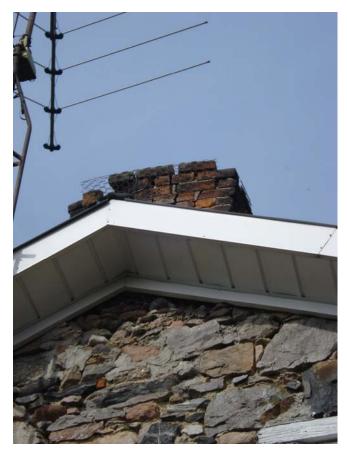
Spalling chimney with little remaining mortar, held together with chicken wire.
